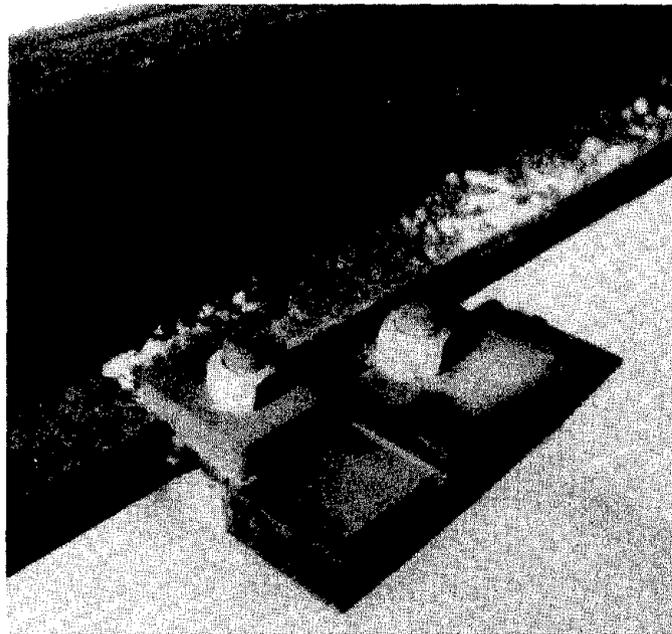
RAIL FASTENER ON METROPOLITAN ATLANTA
